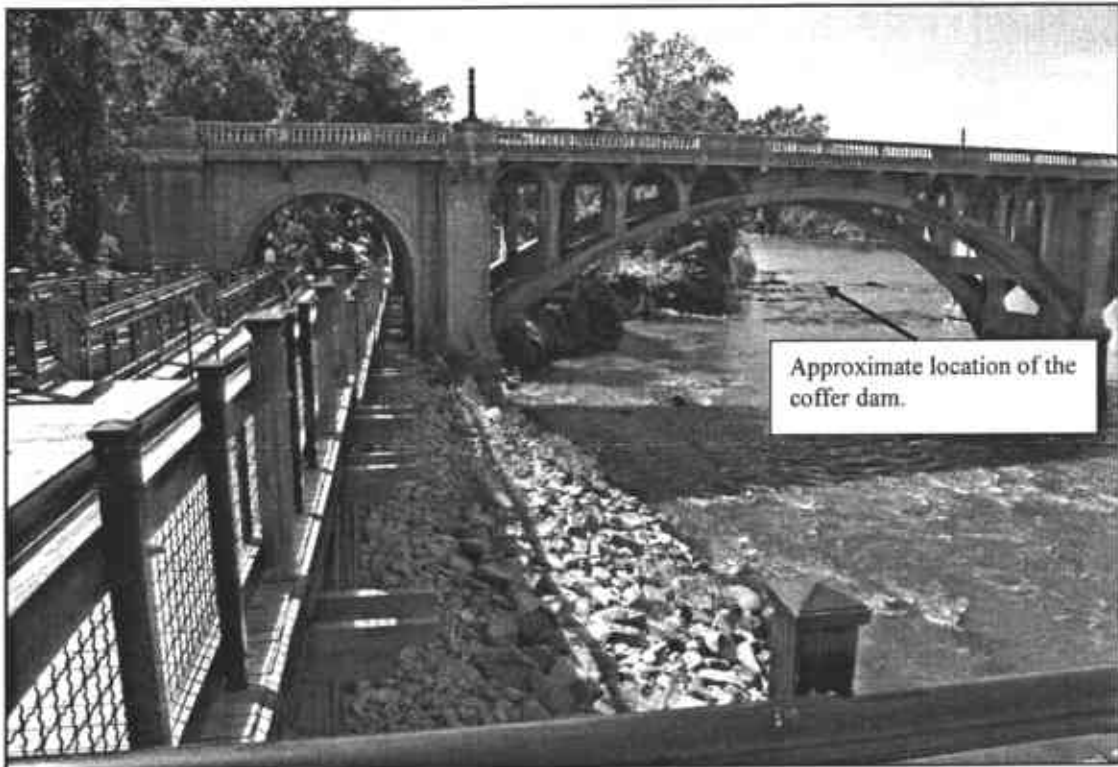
View from Columbia Canal Hydro Plant to project area. Note rip rap.
